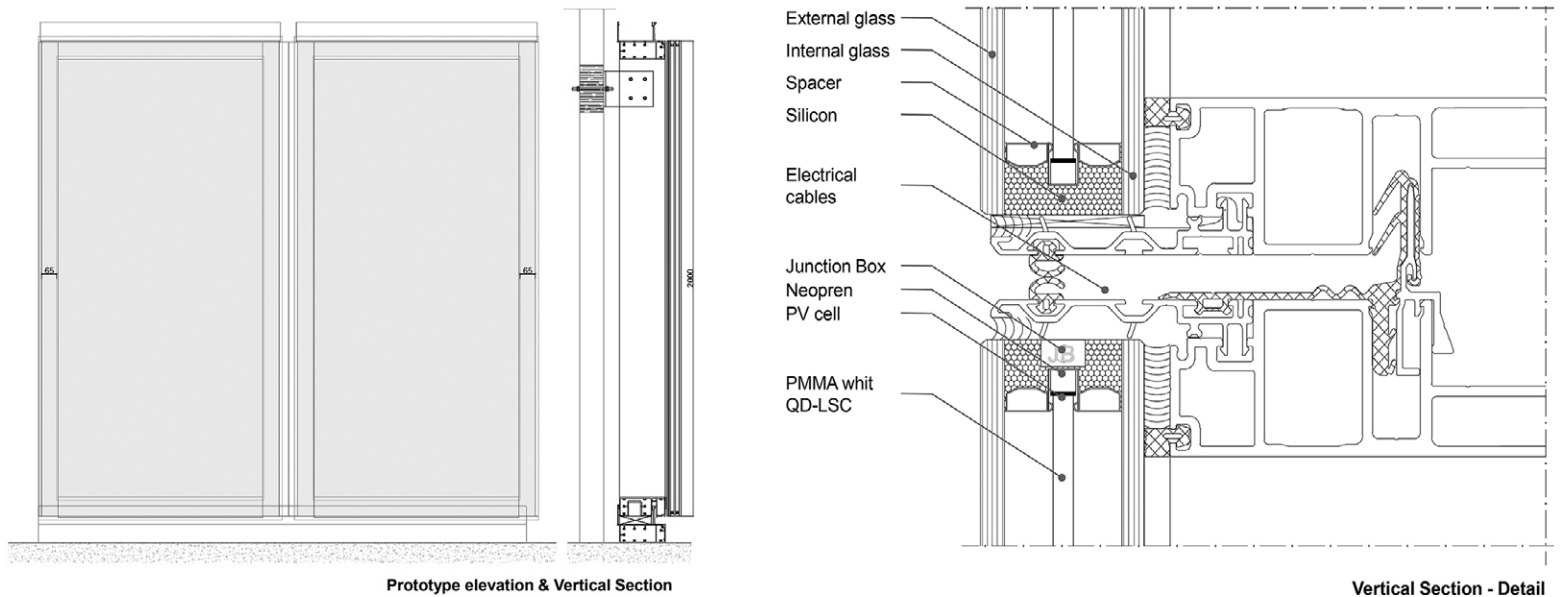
, 13 | Drawing of integration of BIPV in curtain wall façade (credits: Levery, 2024).
